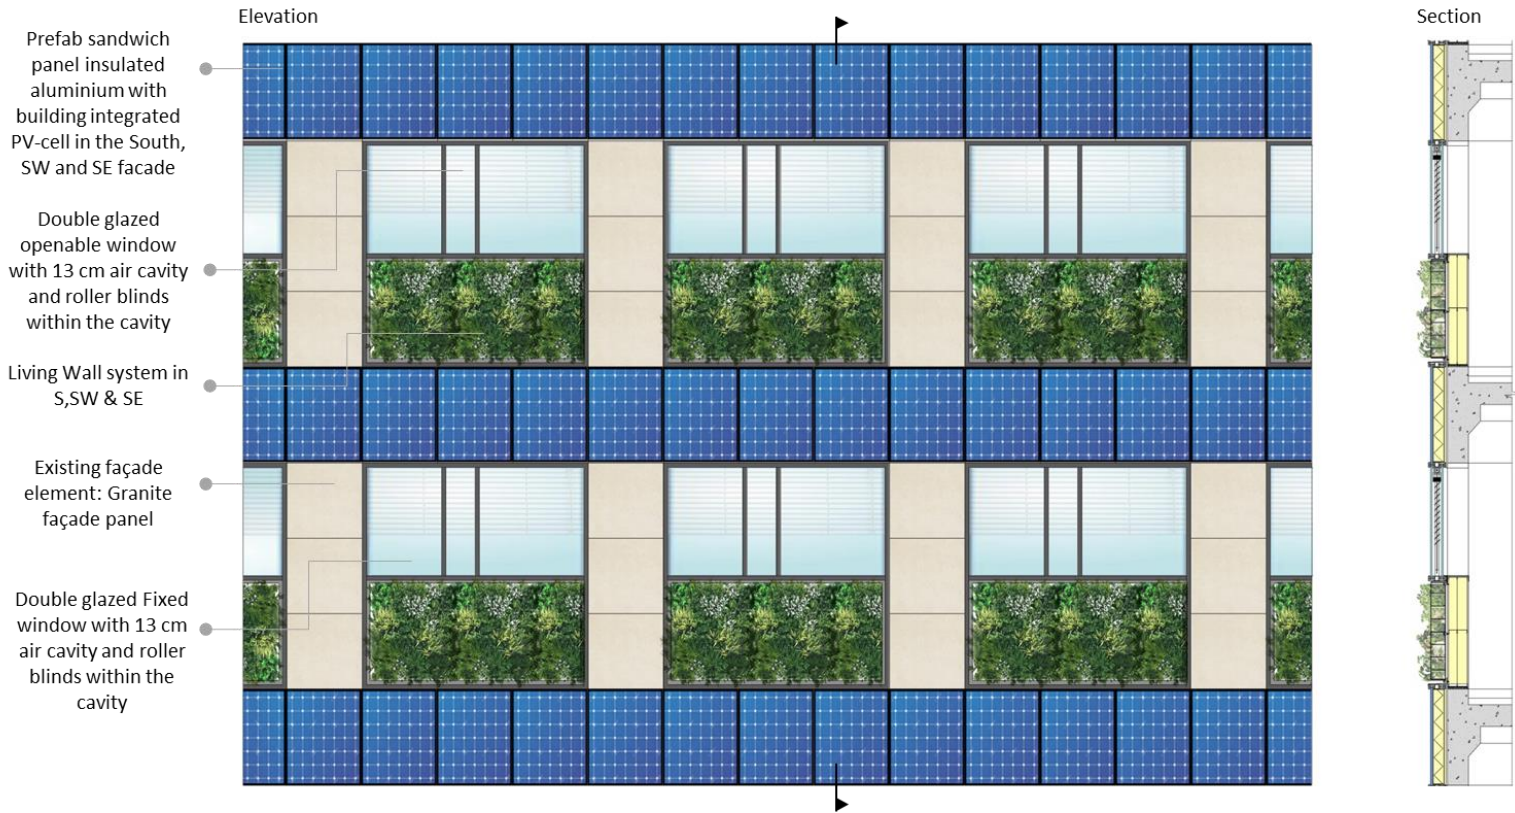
Refurbished facade with Living Wall System and BIPV
